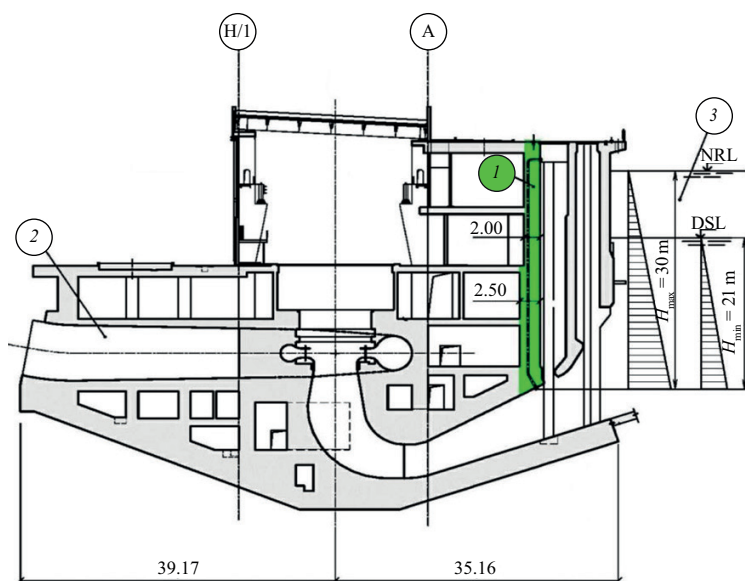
Vertical section of the head building of the PSPP (dimensions in m): 1 — retaining wall; 2 — pressure conduits; 3 — lower reservoir
